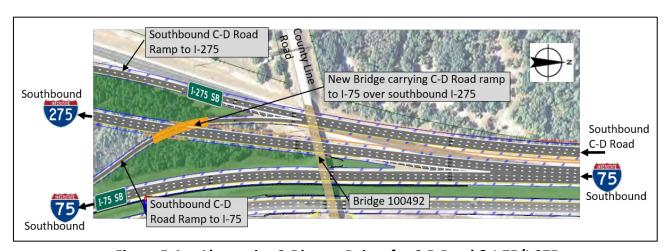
Alternative 2-Diverge Points for C-D Road & I-75/I-275
